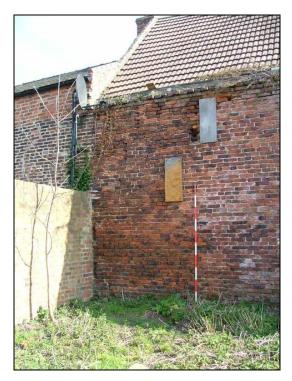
North end of west elevation showing boarded ventilation slits and continuation of brickwork into Farm Cottage. Note the heightening of the wall of Farm Cottage which creates a different pitch roof (Scale = 2m)
